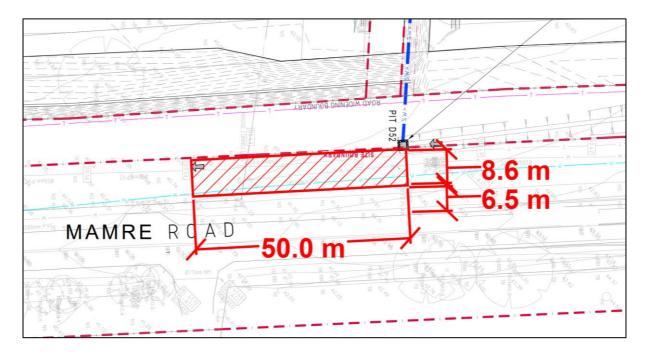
After Hours Loading/unloading of Plant Opposite Lot 9 Along Mamre Rd.
